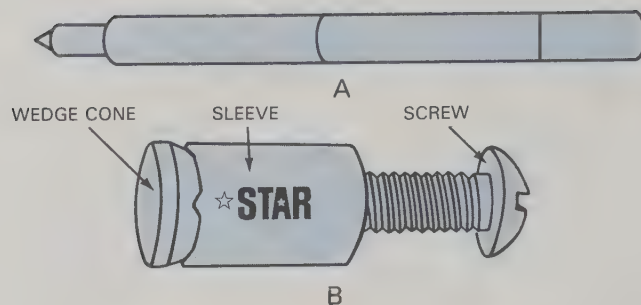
One type of masonry anchor is set with a tool to expand a sleeve against the sides of the hole before the screw is inserted. A—Setting tool. B—Anchor, consisting of wedge cone, sleeve, and screw.
